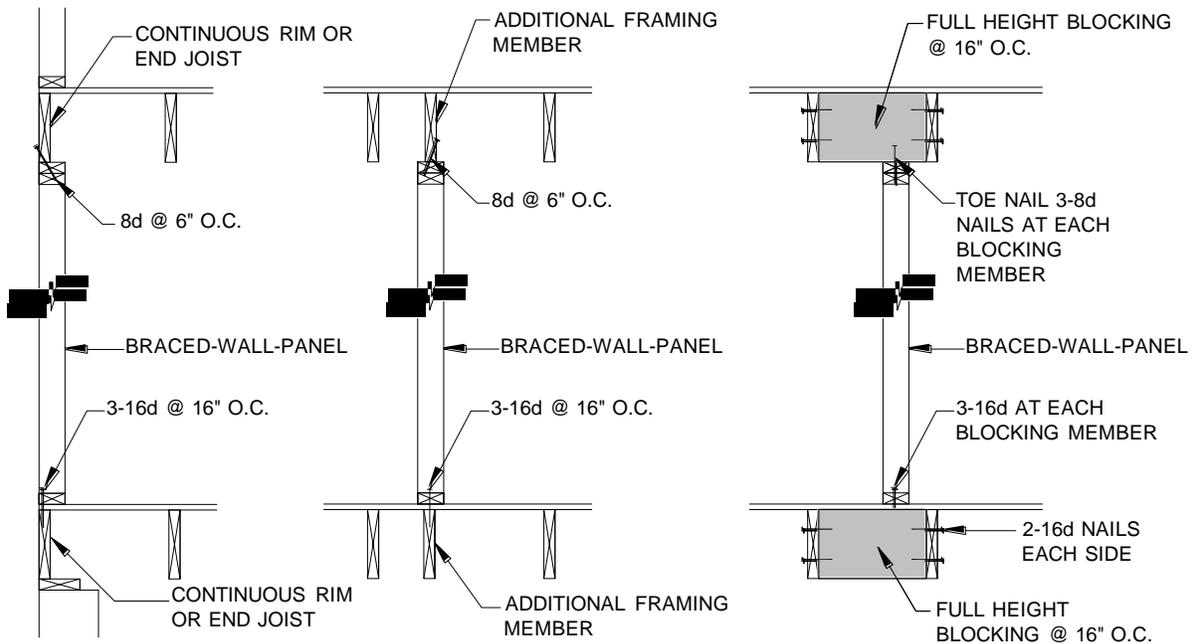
BRACED-WALL-PANEL CONNECTION WHEN PARALLEL TO FLOOR/CEILING FRAMING
